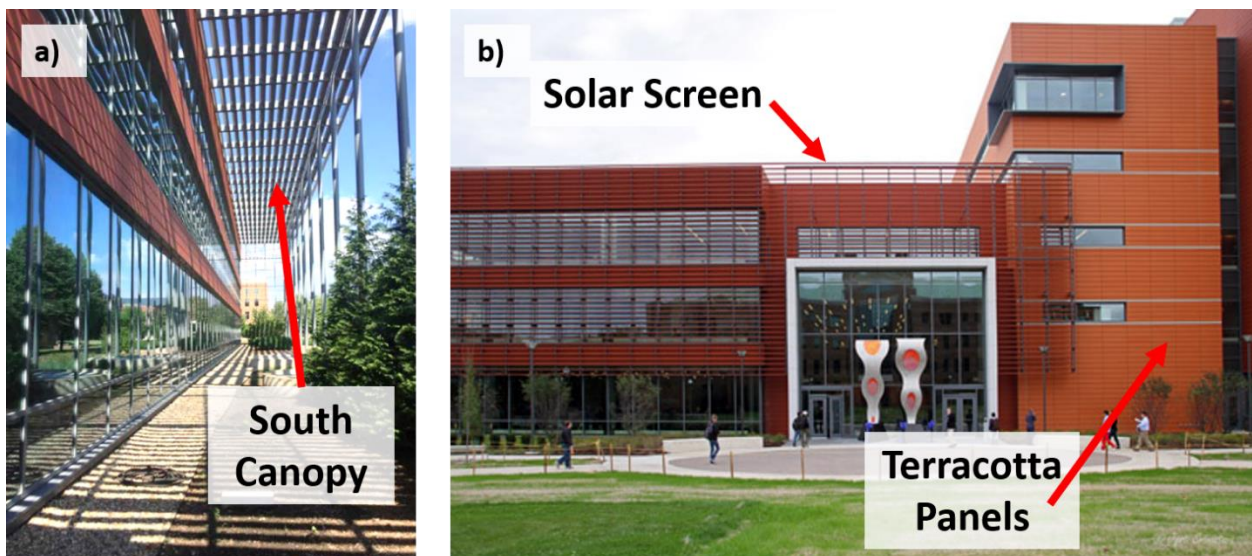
ECE building envelope a) South canopy, b) Terracotta panels and solar screens on the east side
